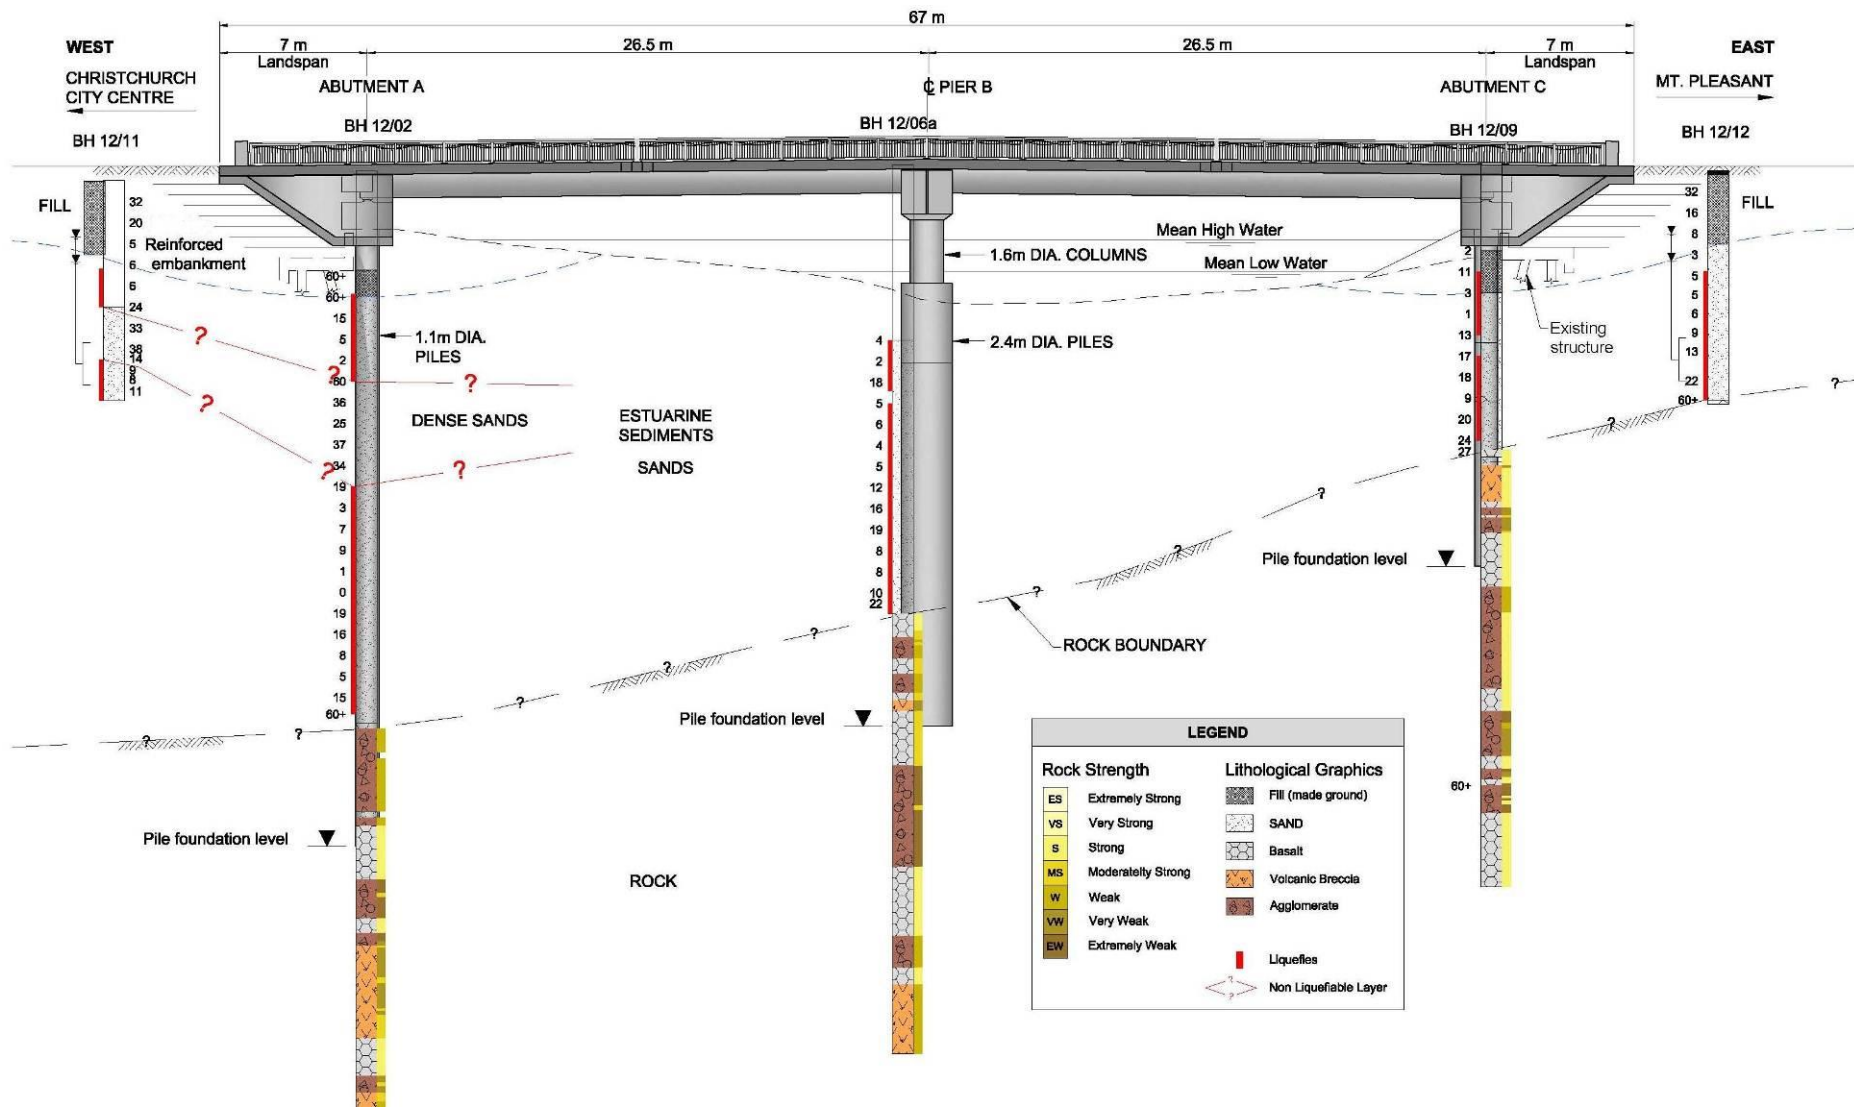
Longitudinal section showing the ground conditions and liquefaction vulnerability.
